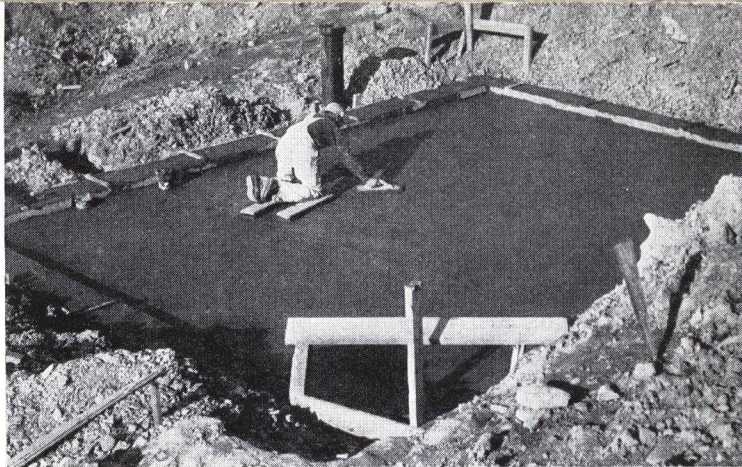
FIG. III—ONE PIECE FLOOR AND FOUNDATION—The monolithic concrete floor and footing with a 3½-in. raised edge are poured in one operation, thus eliminating a second return of the concrete crew. Plumbing and sewage pipes have to be laid before pouring is done.
